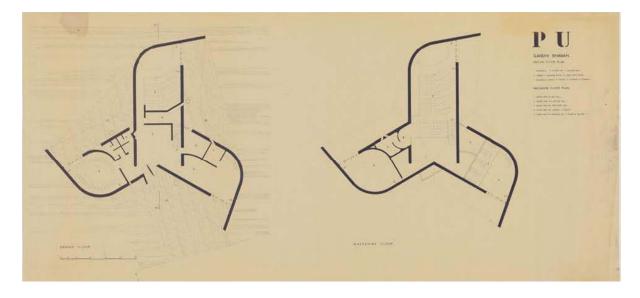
Layout plans of Gandhi Bhawan (Source: CCA Archives, Montreal)
